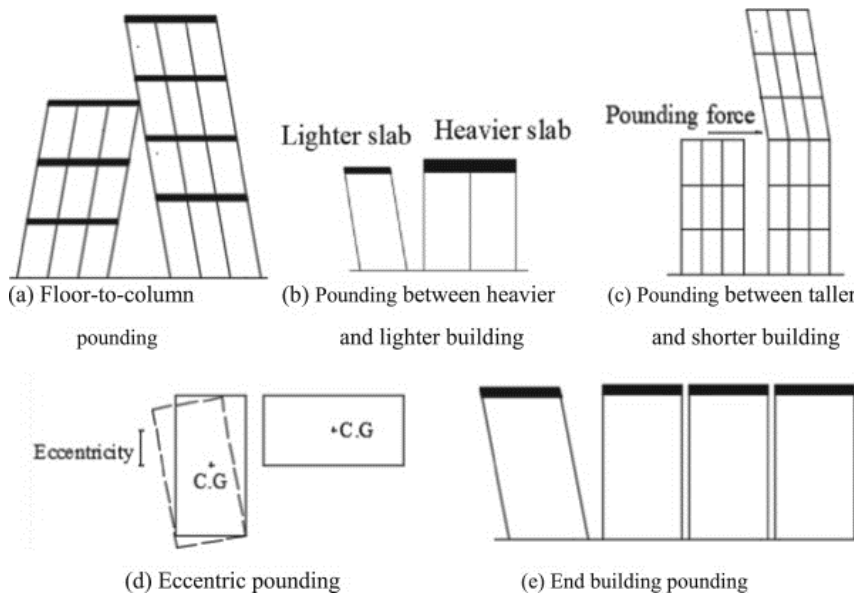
Failure due to inadequate gaps between buildings (civiljungle.com).
